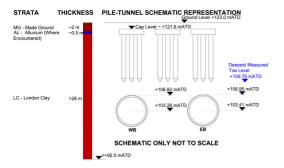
Tunnelling beneath 4–18 BBR piled building for Crossrail, London (Williamson 2014).
